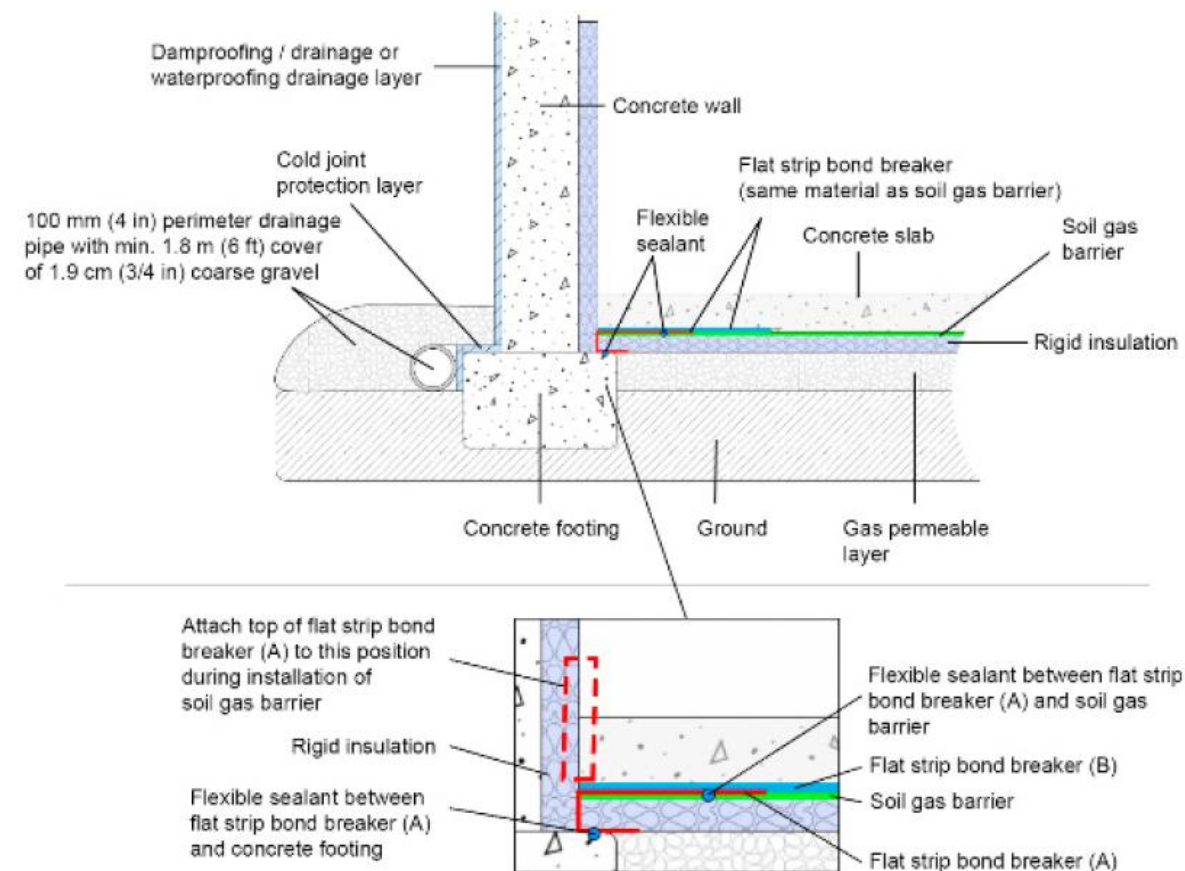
Installation of soil gas barrier on concrete foundation (with insulation)
